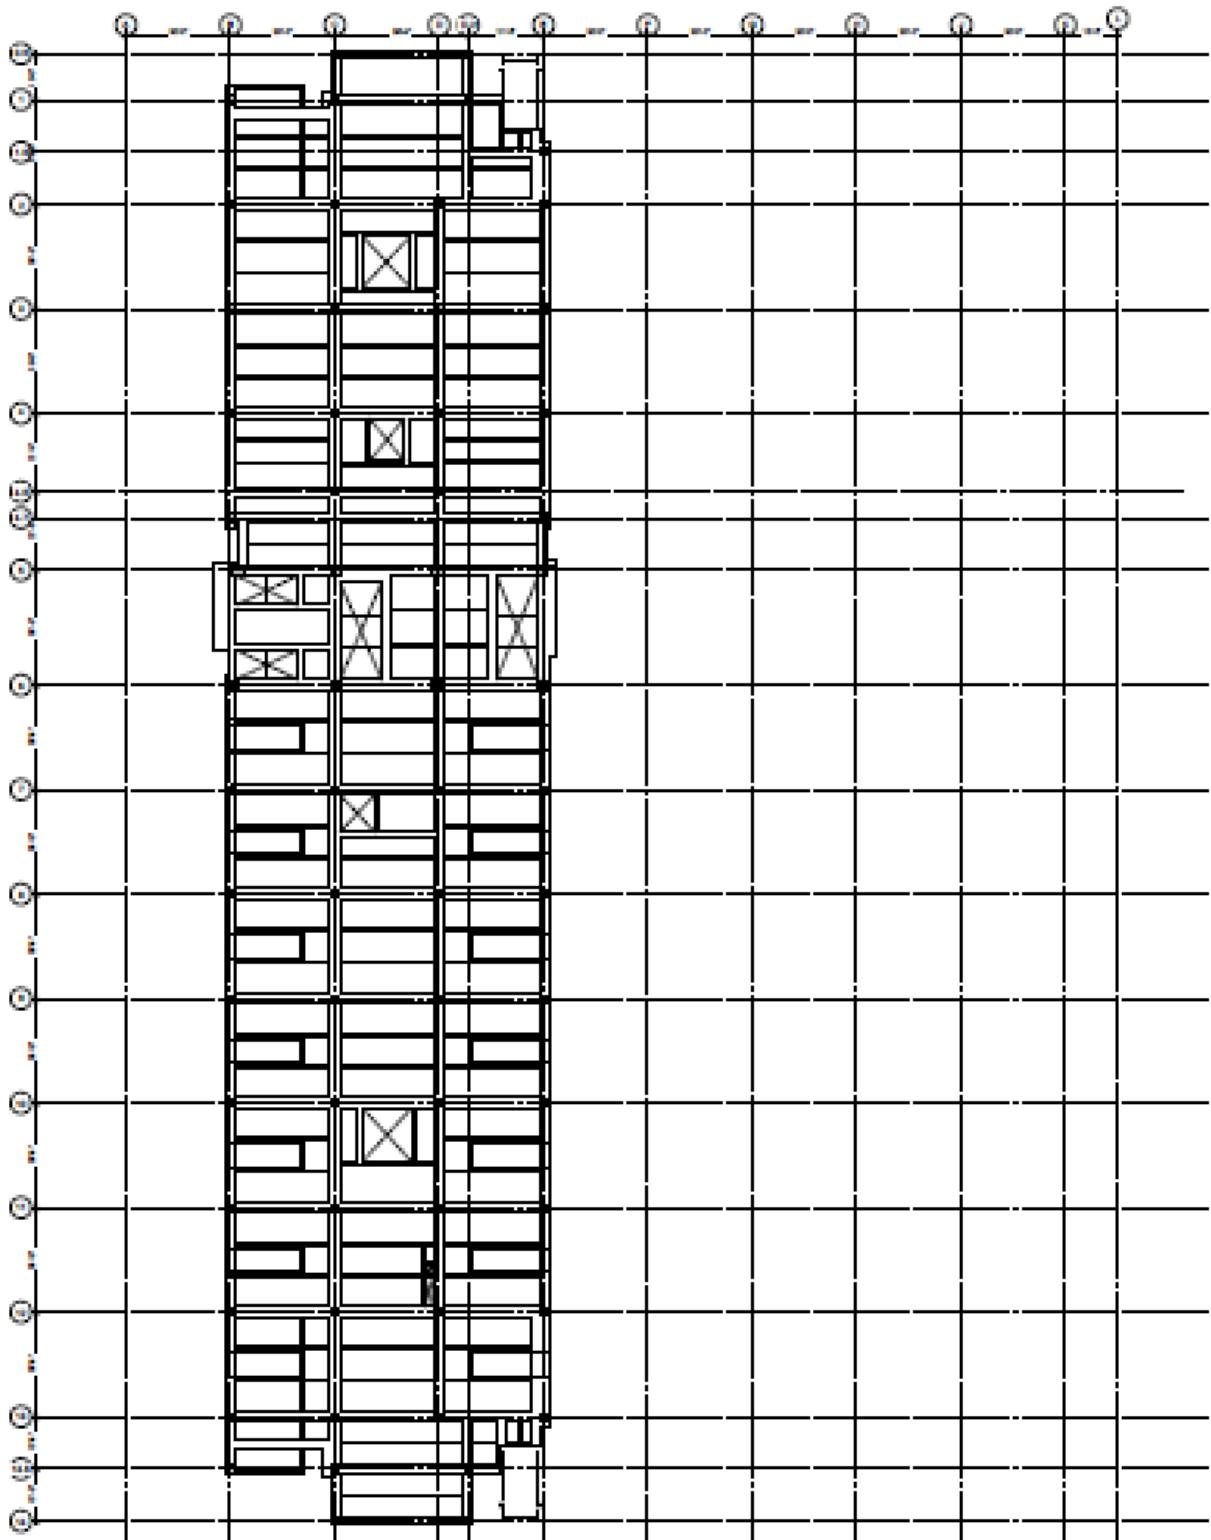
| Typical Structural Floor Plan for Floors 7-9 (Walter P. Moore)
